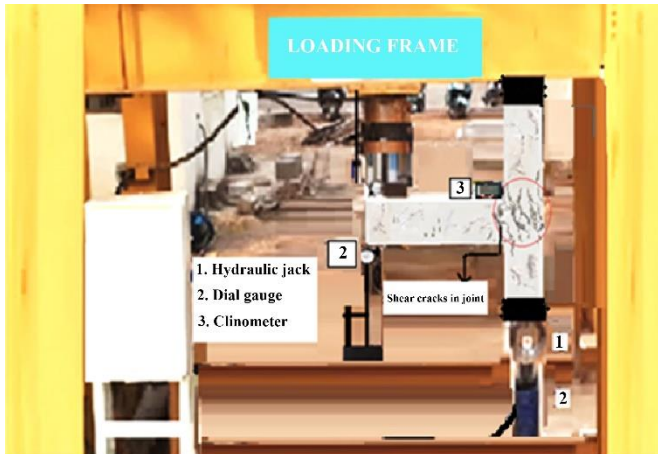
(a) Testing of Conventional Straight anchorage system(CBCJ1)
